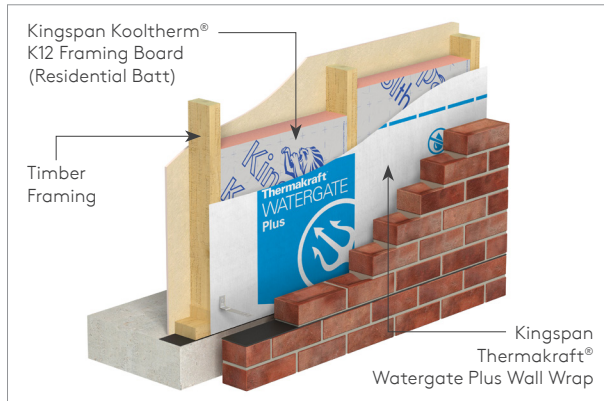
Rigid Board Insulation between Studs for Timber Frame.
